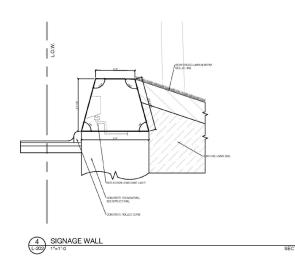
Signage Wall Lighting Detail (90% FD Drawing Set)
